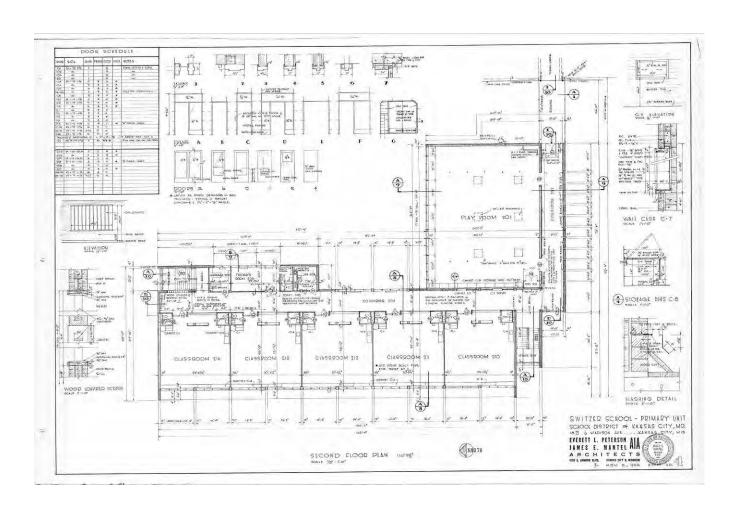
Switzer School: Primary Unit 1956: Second Floor Plan Peterson and Mantel, architects
